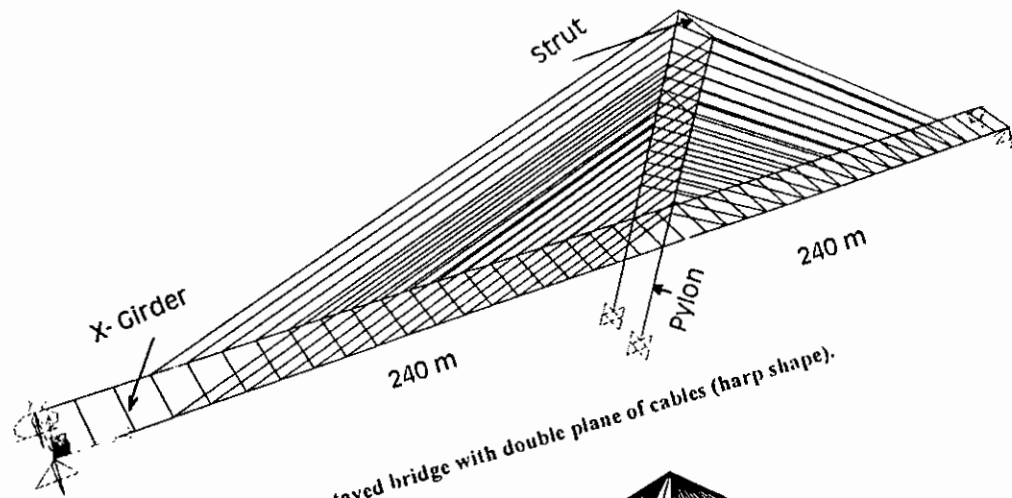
a): Cable stayed bridge with double plane of cables (harp shape).
